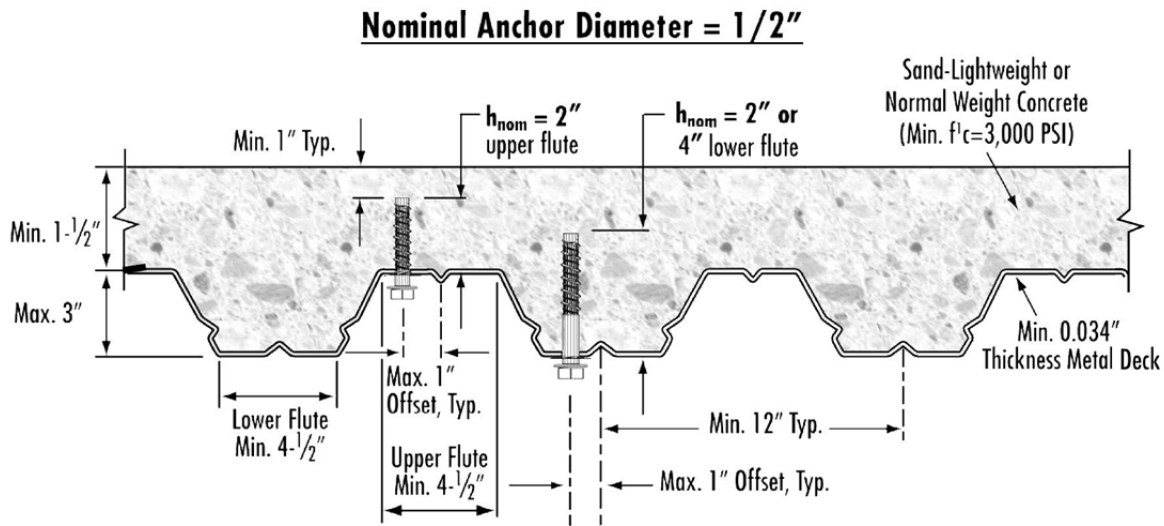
TAPCON® SCREW ANCHOR LOCATED IN THE SOFFIT OF CONCRETE OVER STEEL DECK FLOOR AND ROOF ASSEMBLIES (1 inch = 25.4 mm)
